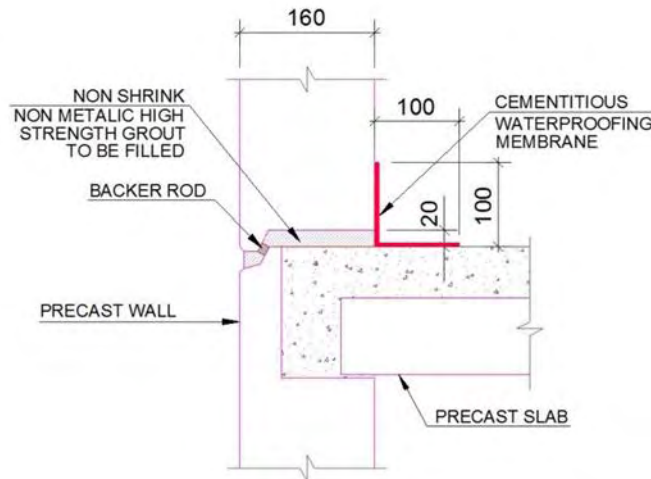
Typical Horizontal Joint Detail Wall to Wall
